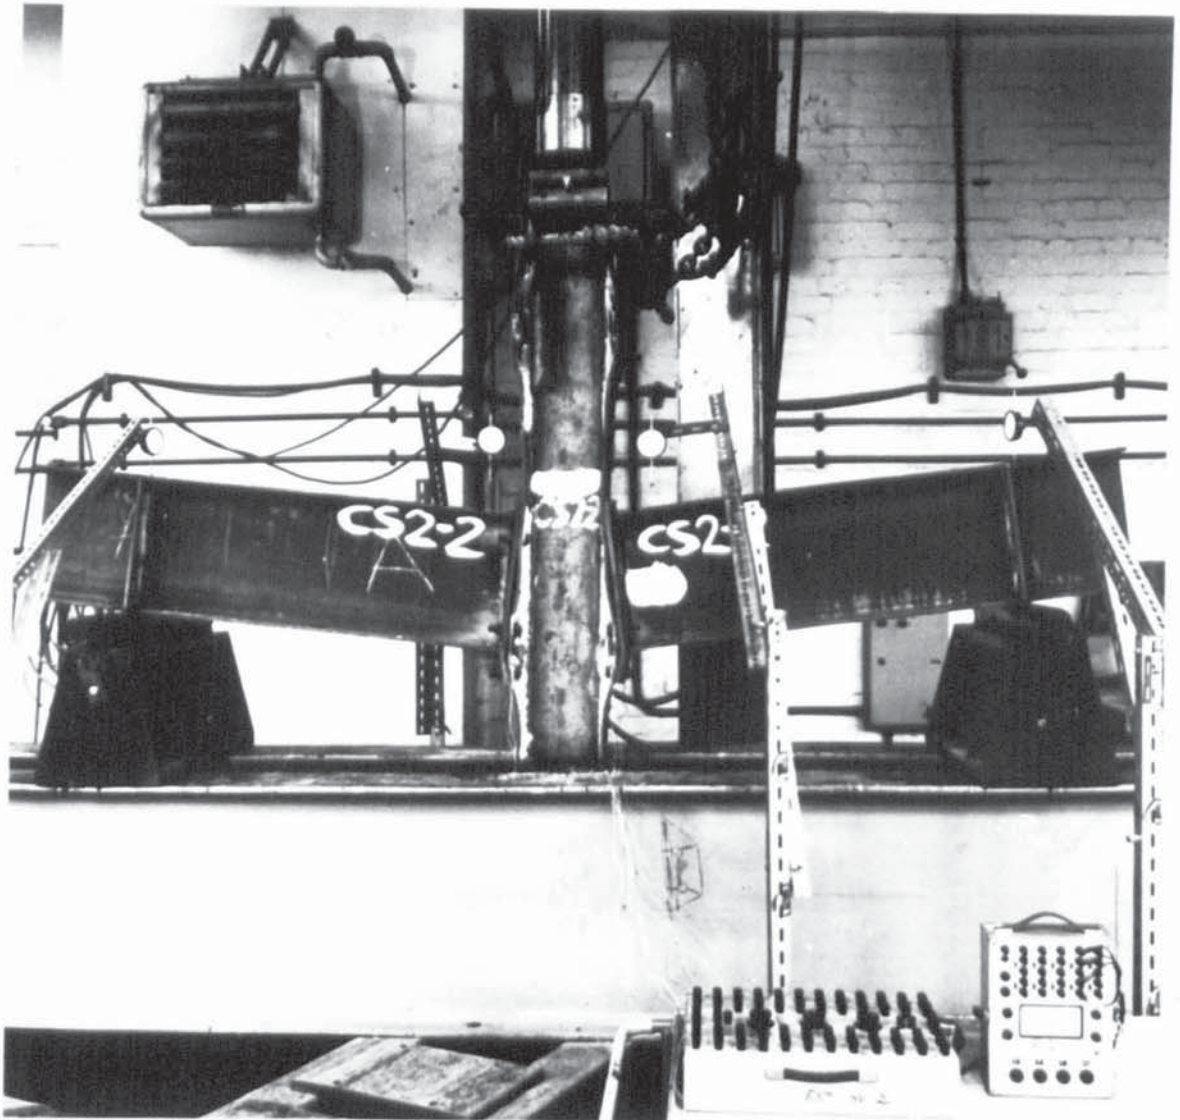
TYPICAL TEST SPECIMEN AFTER FAILURE
